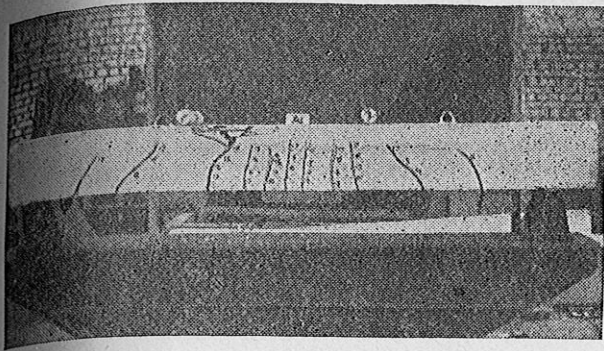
Showing the flexural failure of a lightweight concrete beam
